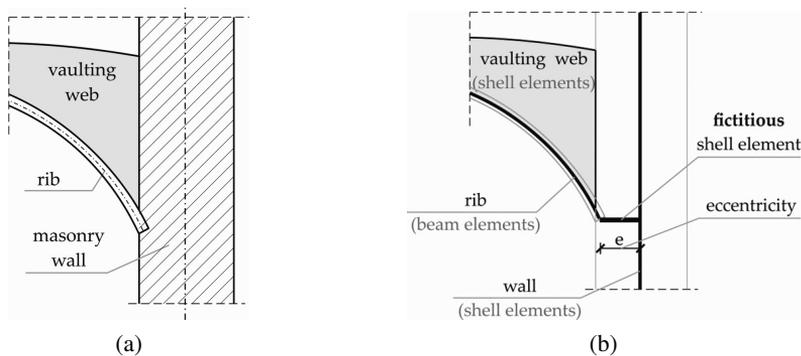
Modelling of the connection of vaults with walls: a) a sketch illustrating how the loads are transferred from the vaults to the walls; b) sketch of the model of connection of eccentrically oriented shell elements [31]
